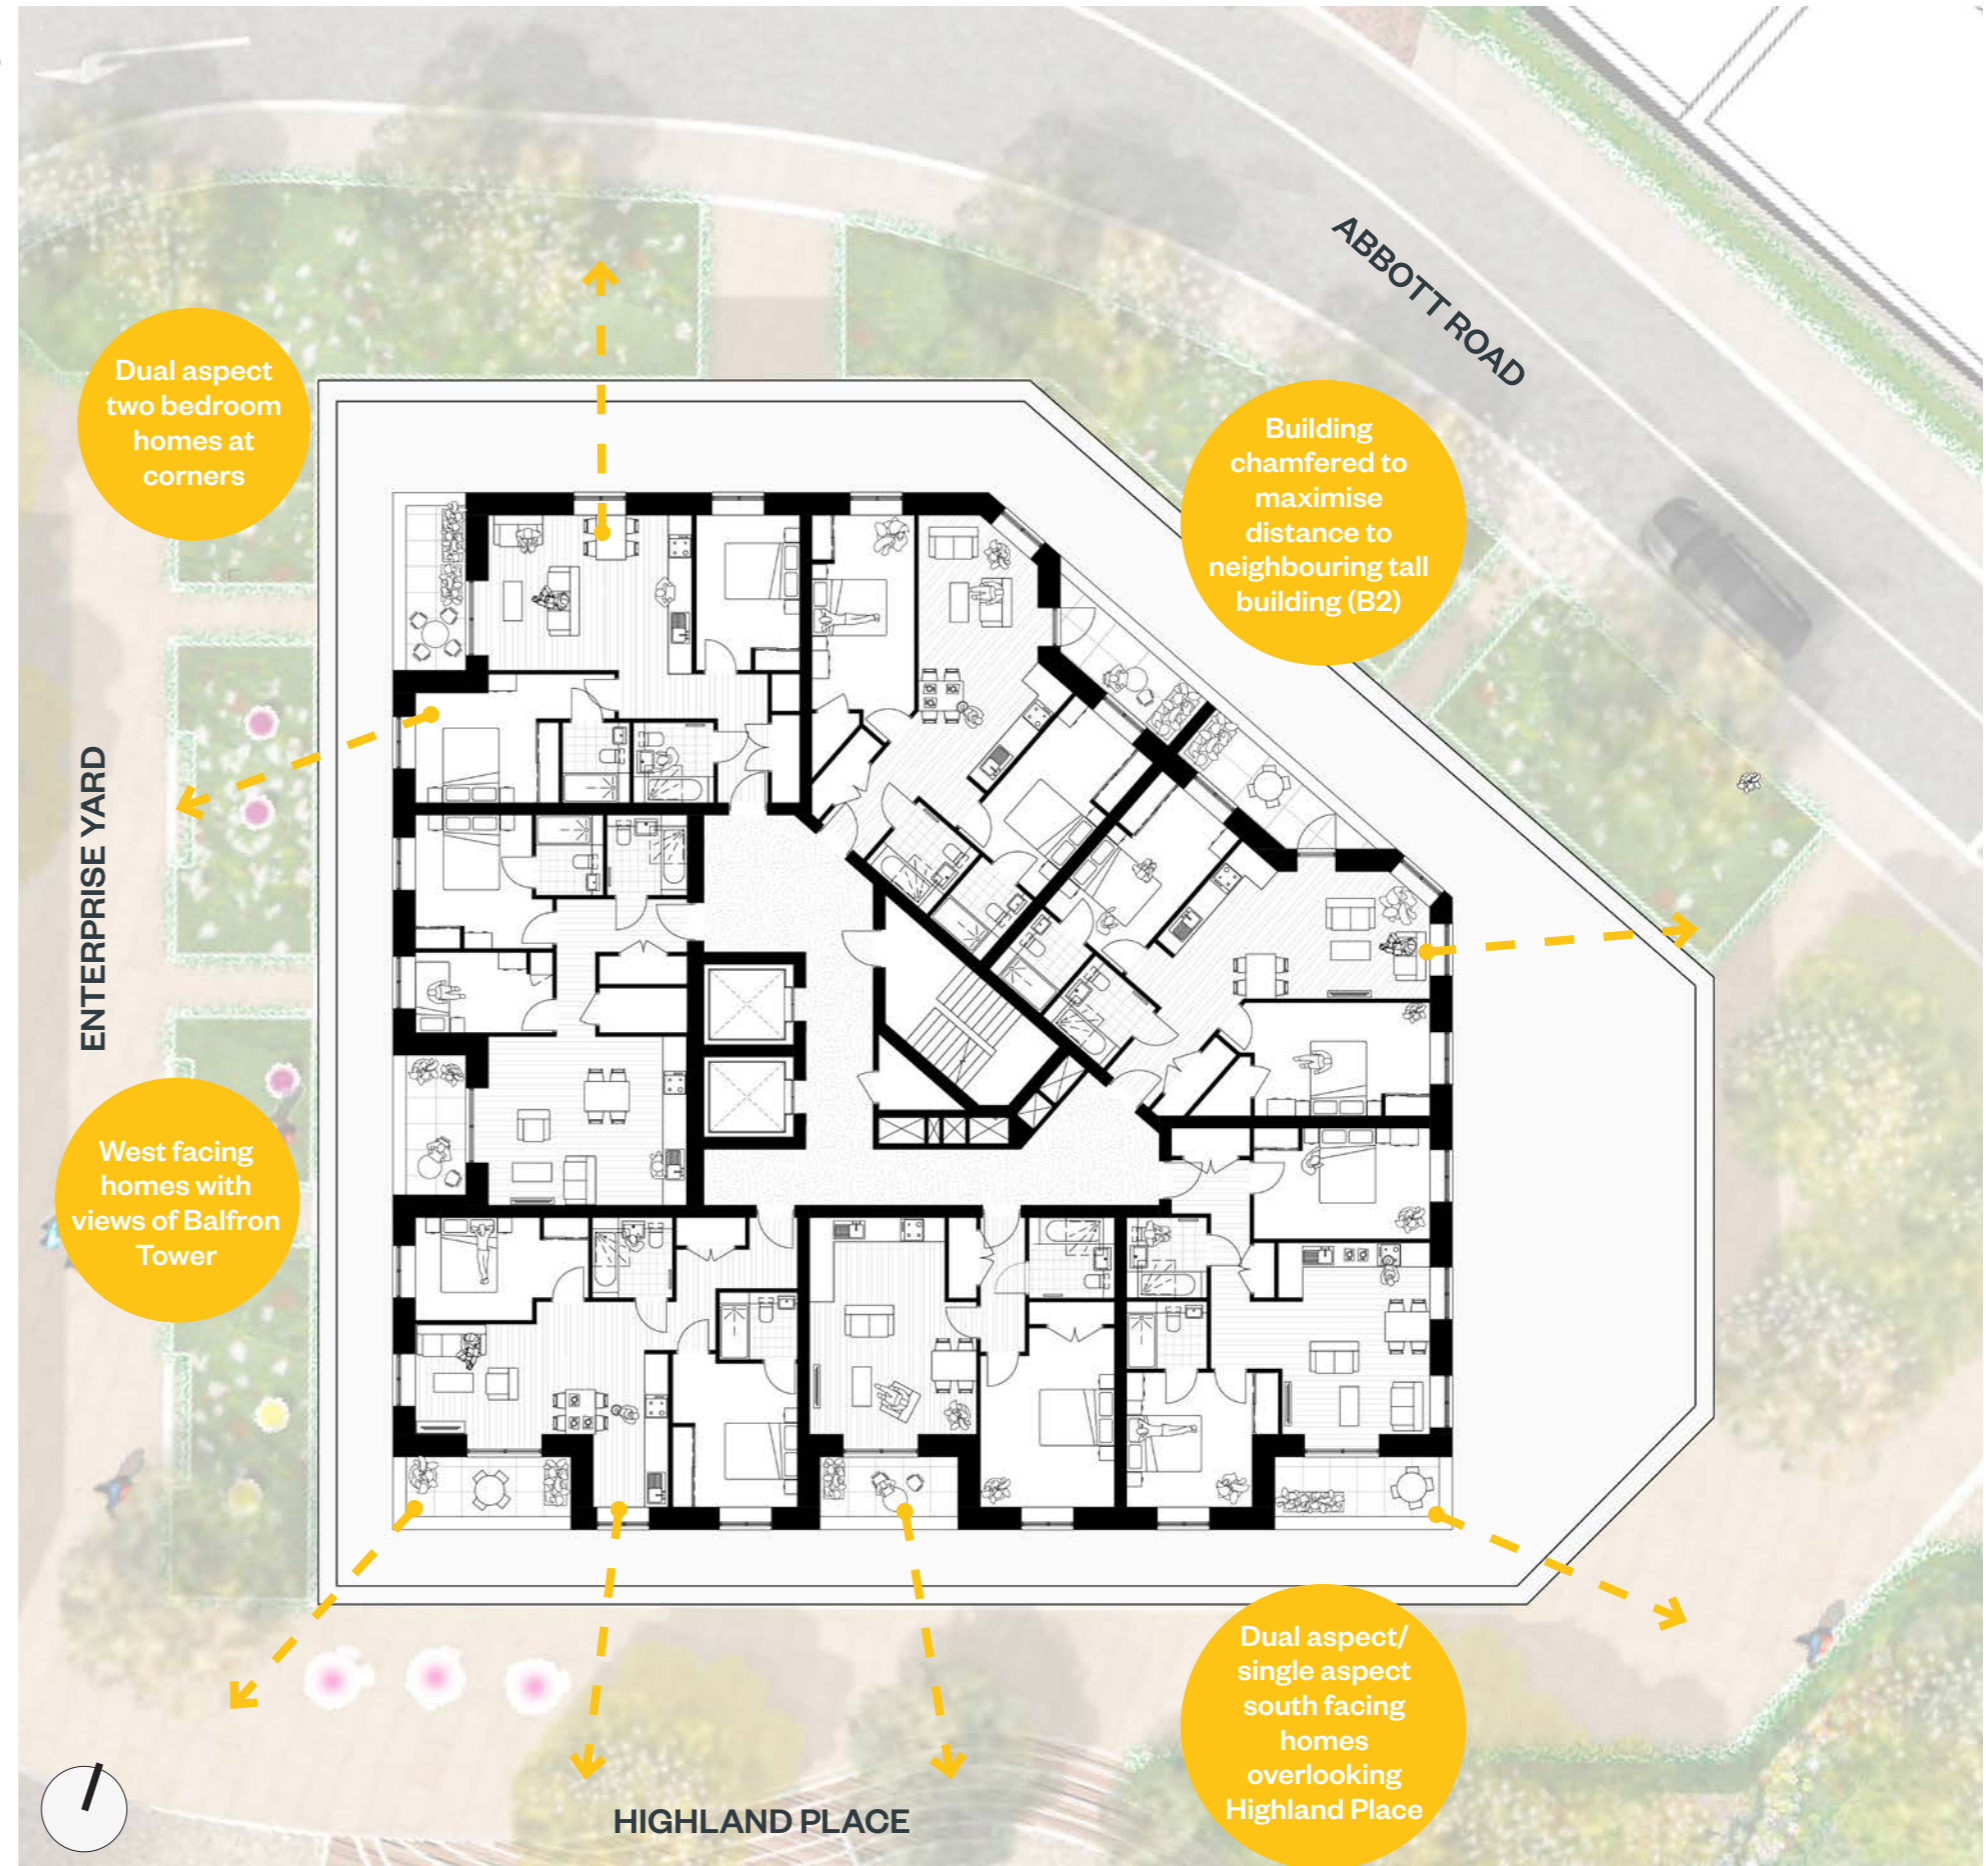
Typical upper floor plan of Building B3 illustrating building organisation and the internal plan of each home
